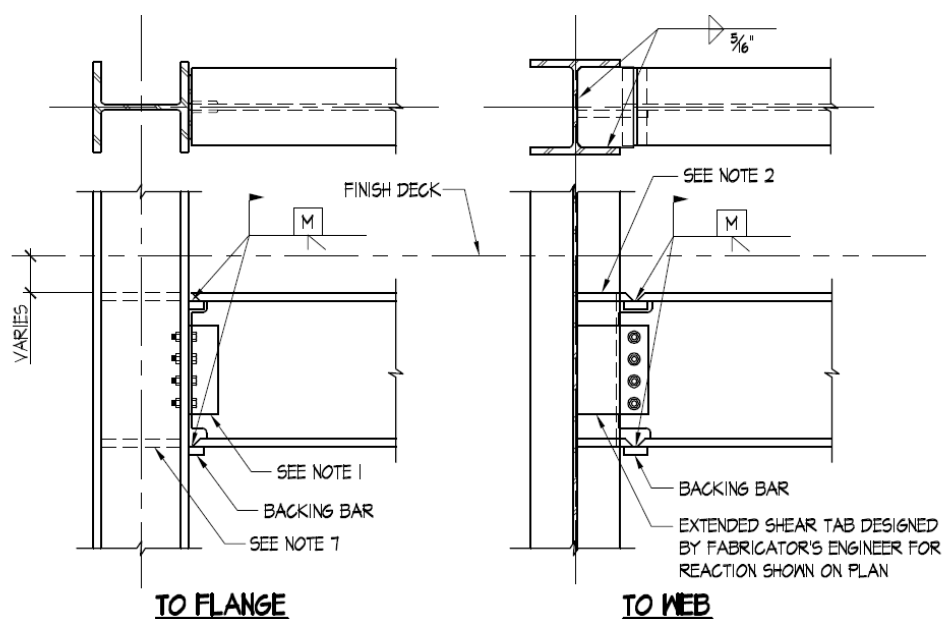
| Beam to Column – Fully Restrained Moment Connection
